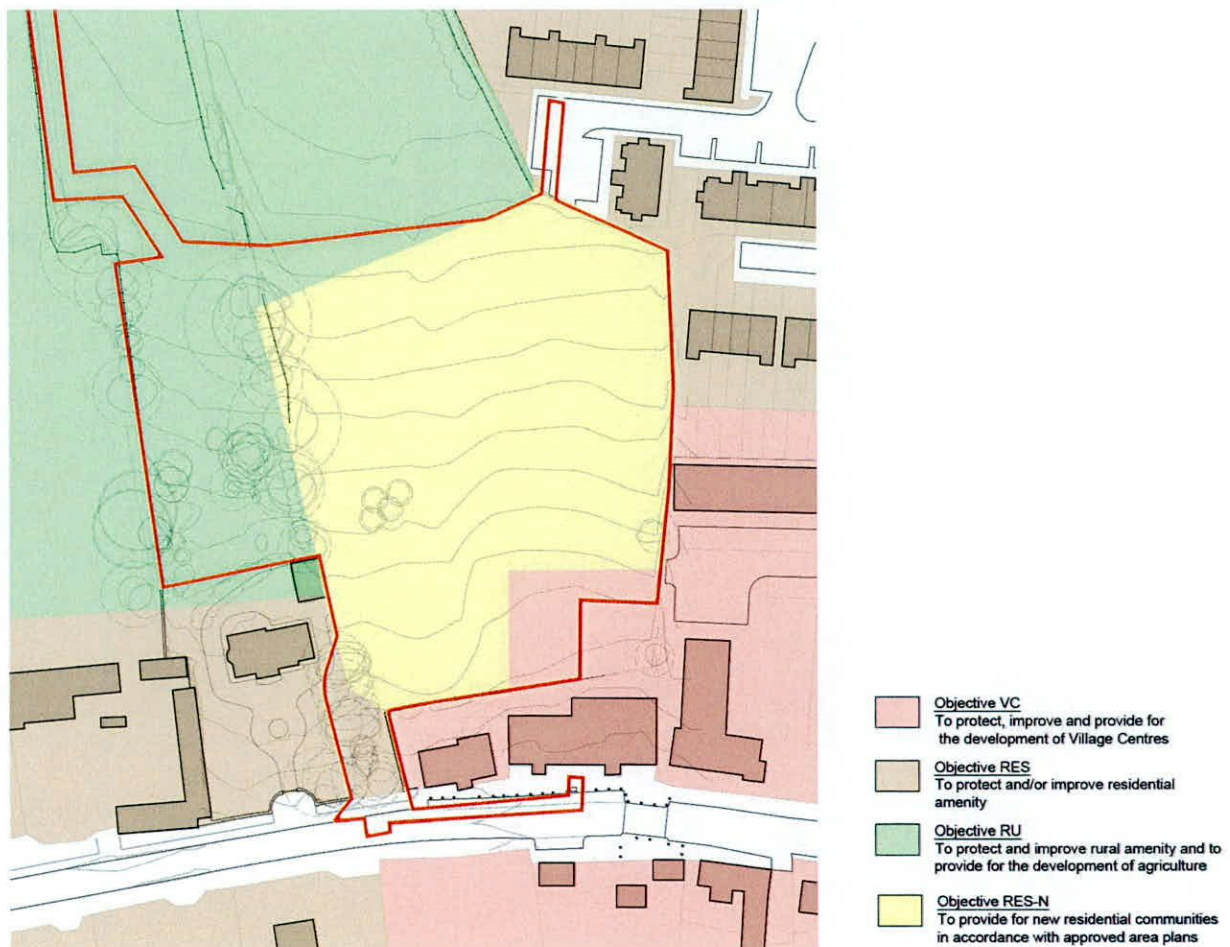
Site Plan showing Areas Zoned in the South Dublin County Development Plan 2016-2022
